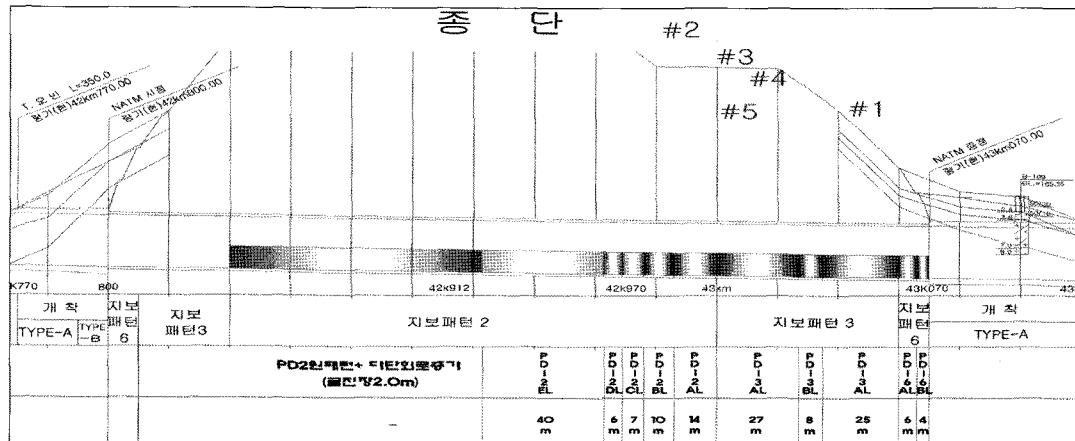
The blasting pattern by a blasting section at the down half section of a tunnel (a cross-section).
